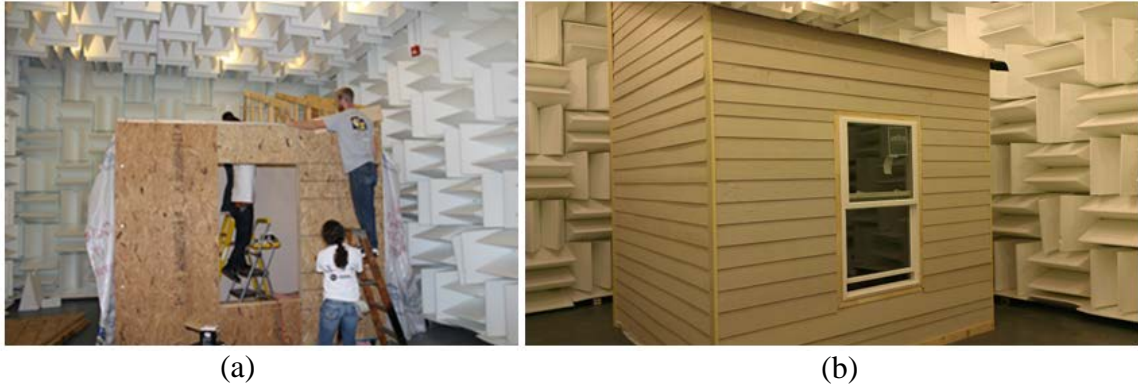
(a) Installation of roof trusses and (b) finished exterior of test house
